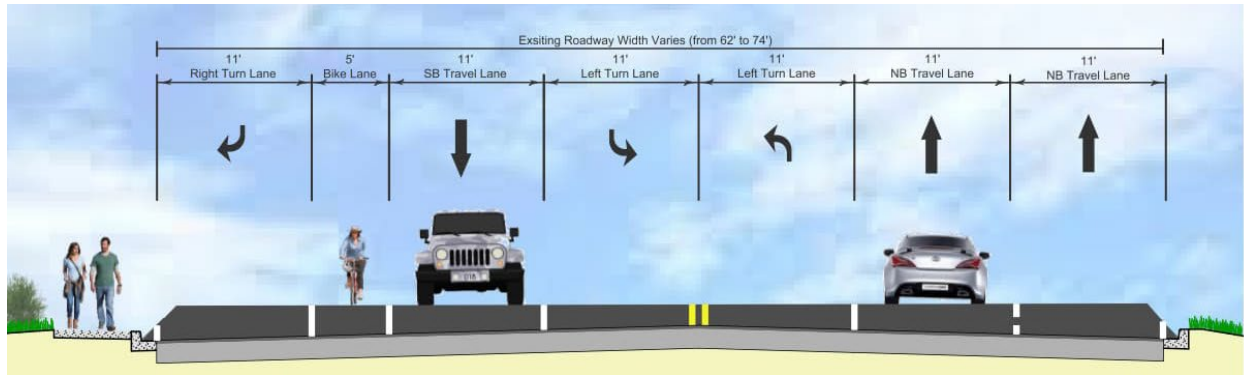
Existing Typical Section MD 272 NE Plaza to US 40
